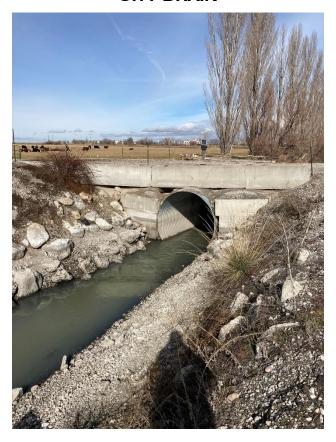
Looking downstream at CDWB1 8ft CMP culvert.
